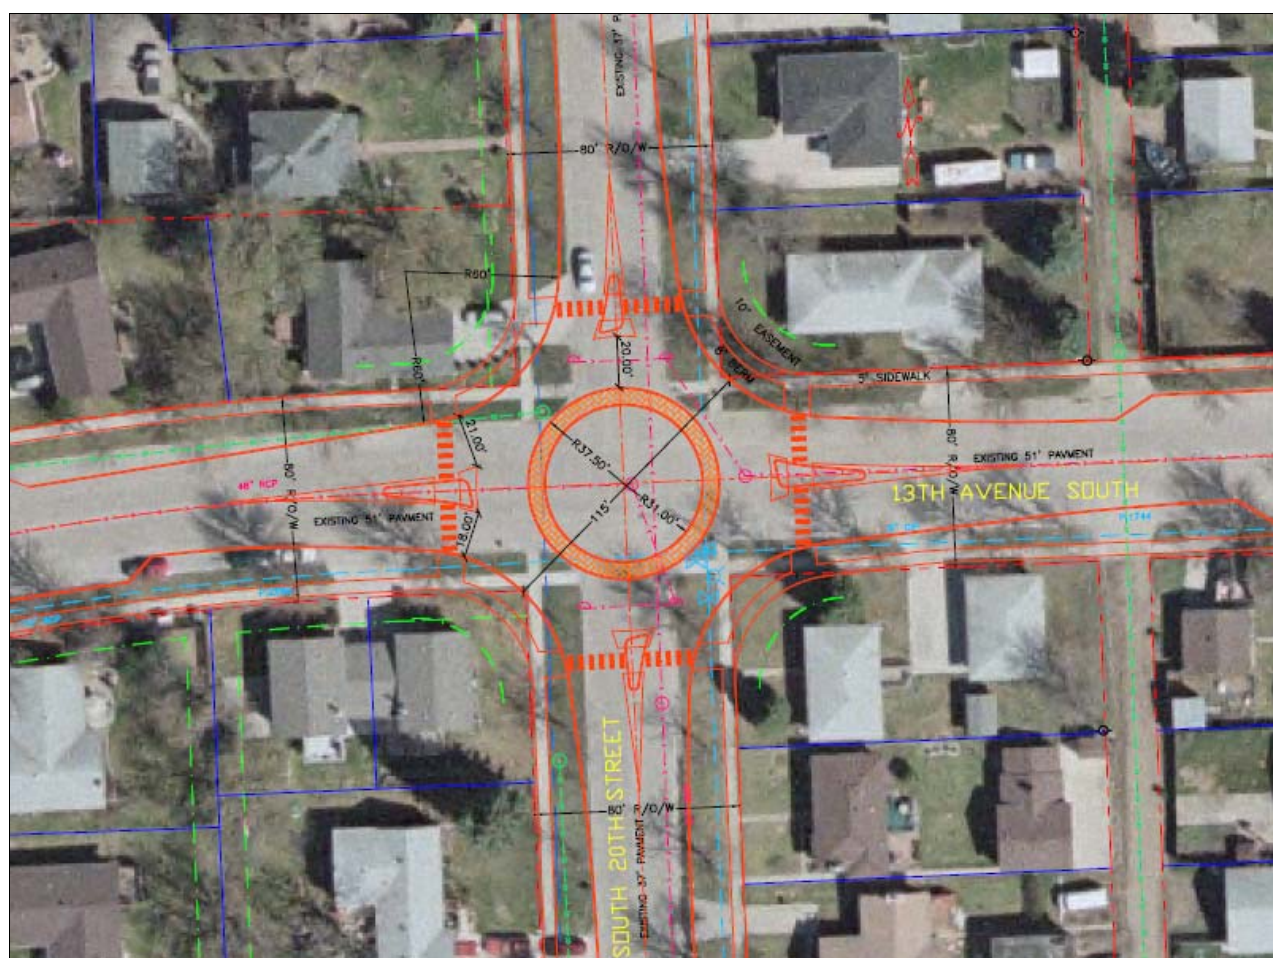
Conceptual Roundabout at 13th Avenue South & South 20th Street
